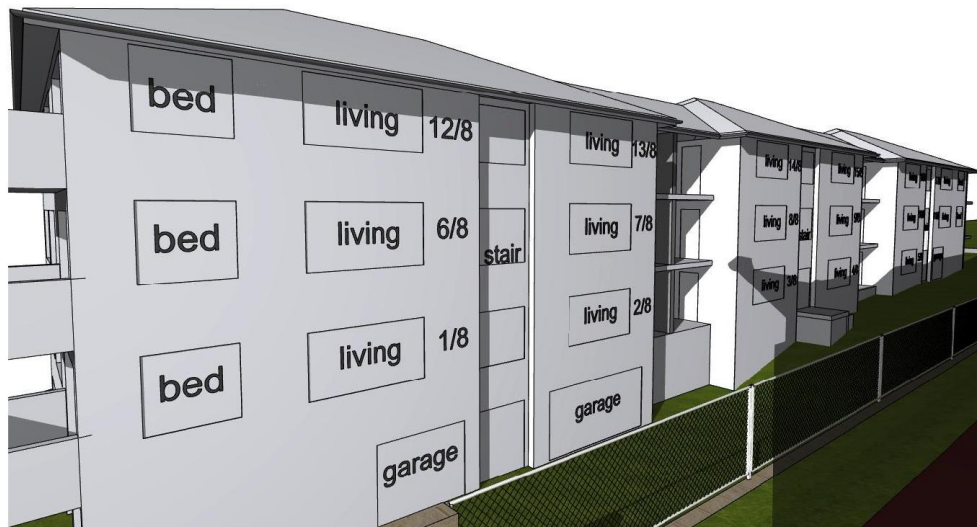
3D Elevational (10.00am, mid-winter) shadow diagram of the adjoining 8 Essex Street building.
